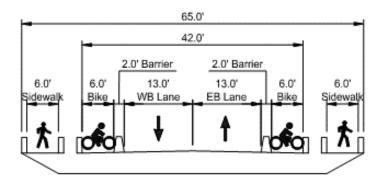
Temporary Bridge – Typical Section (At East and West Approaches)
